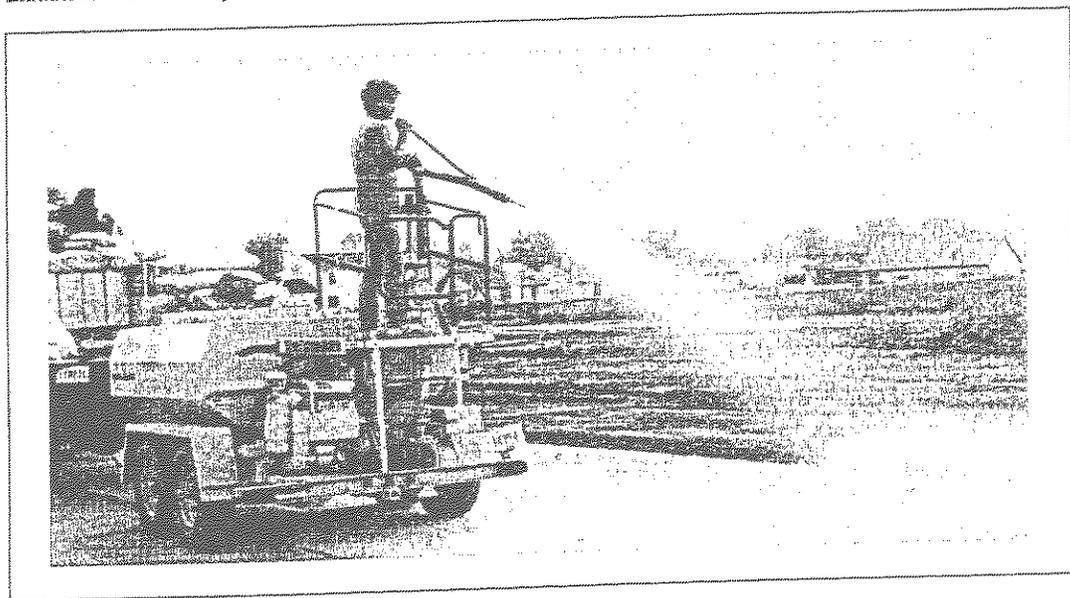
F. Hydroseeding the roadside in a new subdivision.
